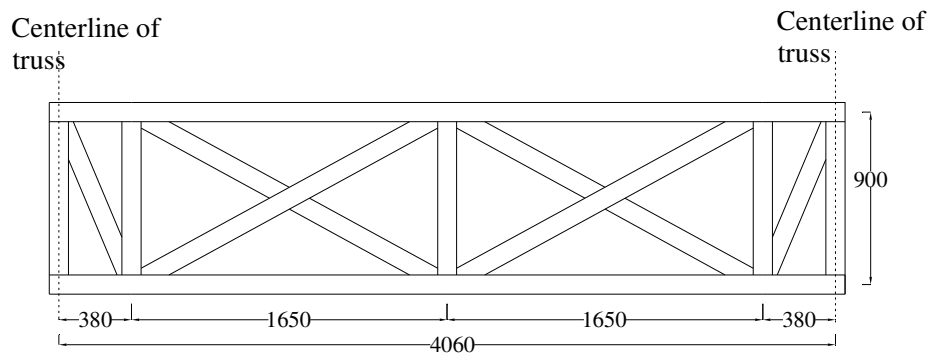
Lattice floor beam made from 4mm thick ST100 section
